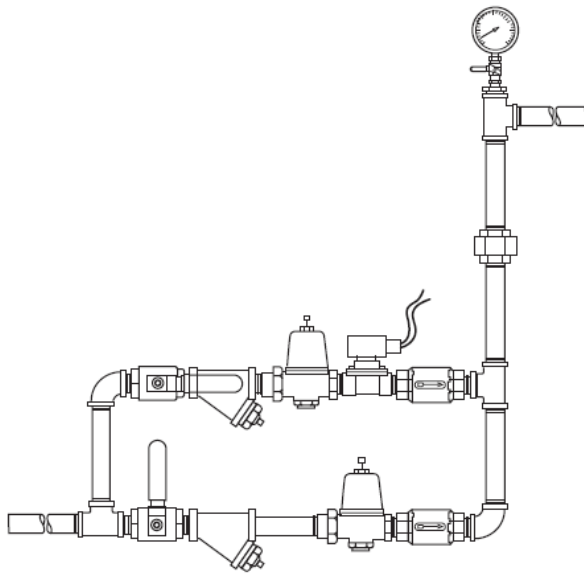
(A) Spring-Loaded Check Valve Arrangement.
